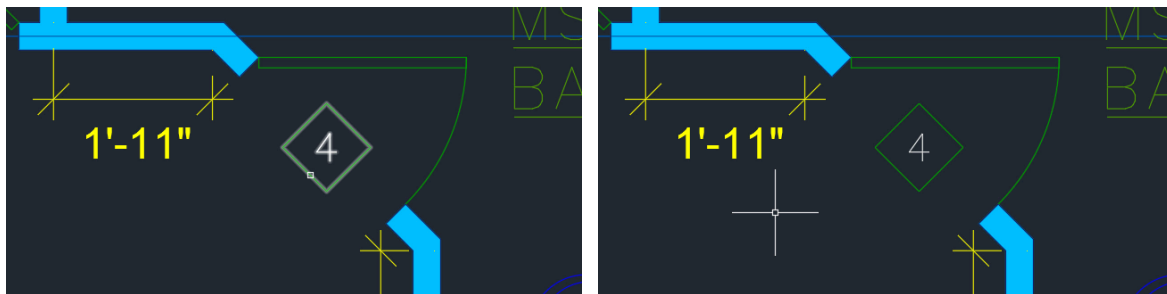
Selecting a Block with Attributes using the Explode Attributes (BURST) command.
